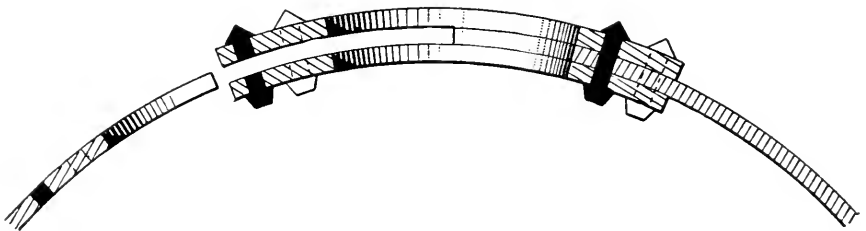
SECTIONAL VIEW OF RING, AFTER FAILURE.
